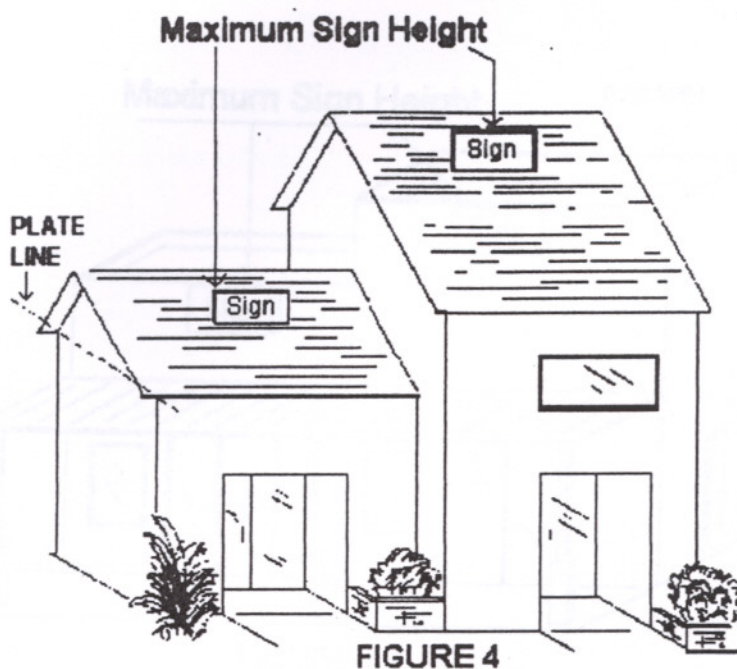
Roof Signs - Section 4-4-8 and 4-4-30
